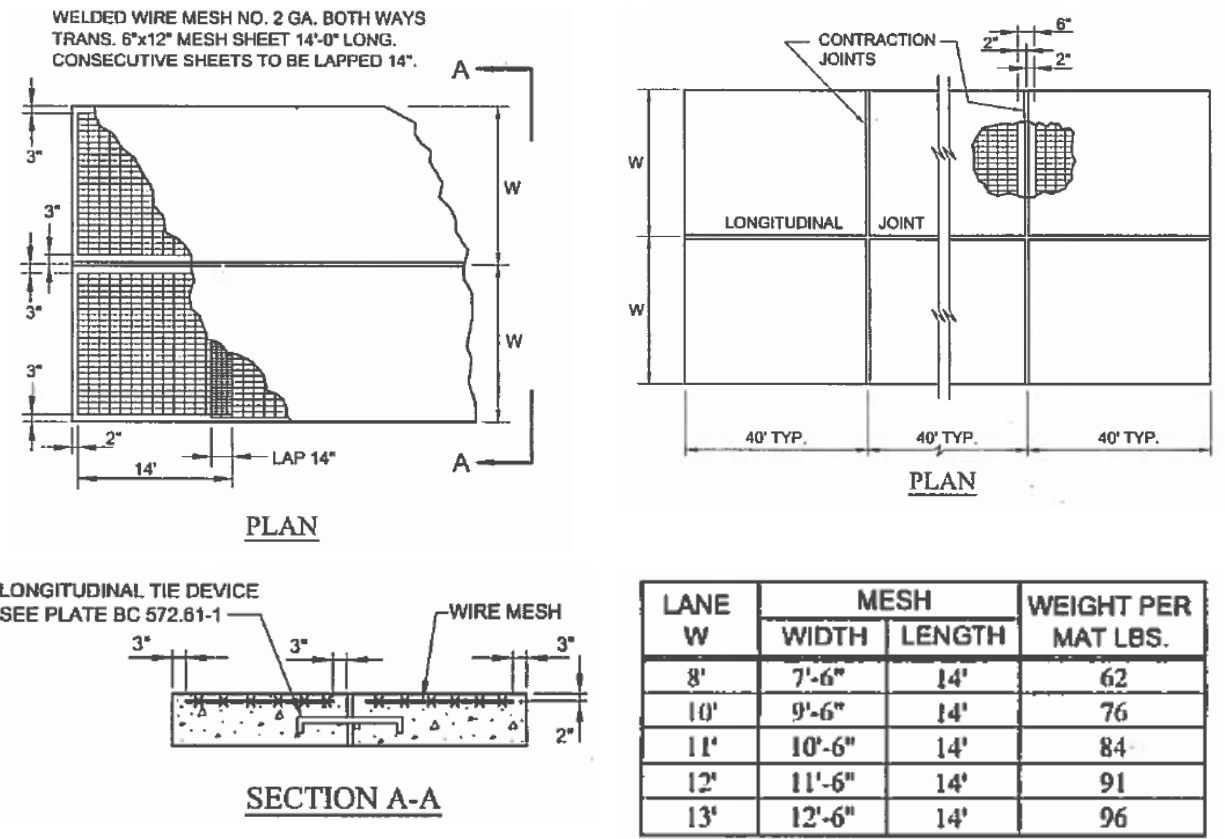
Placement of bar mats reinforced concrete pavement (City of Baltimore Department of Transportation)
